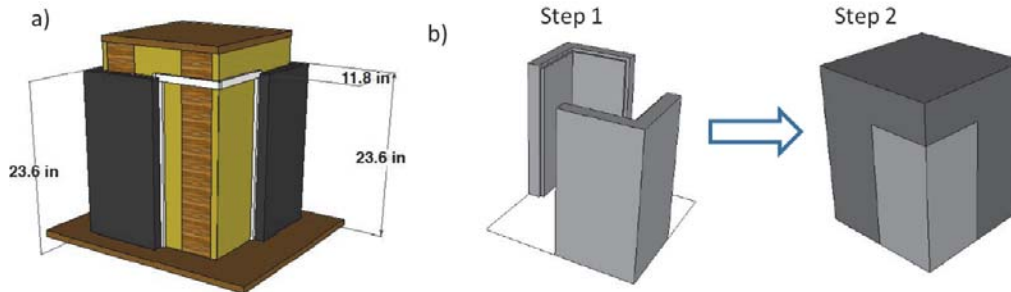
a) The water tank design and the arrangement of plastic spacers and b) the sequence of concrete casting.
